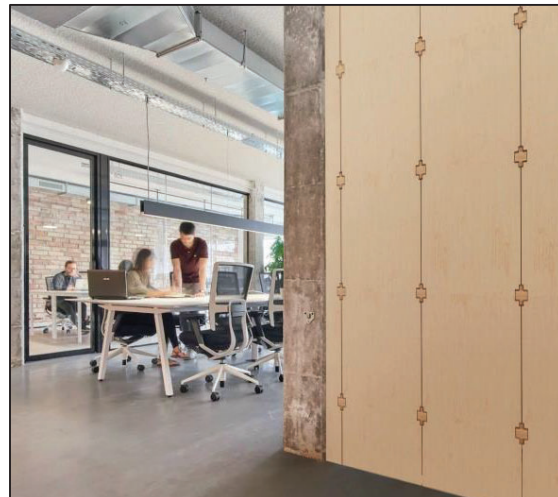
Circular wall system with reused wood. Photo rendering: Grape Architects
